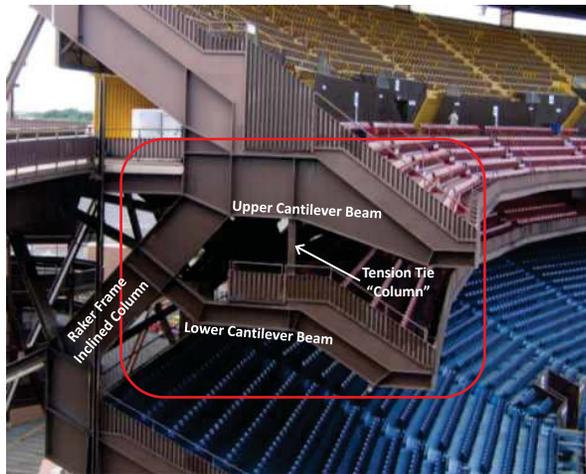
View of a typical end-bay raker frame, with cantilevered raker assembly highlighted by red box. Annotations indicate various features of the cantilevered assembly.
